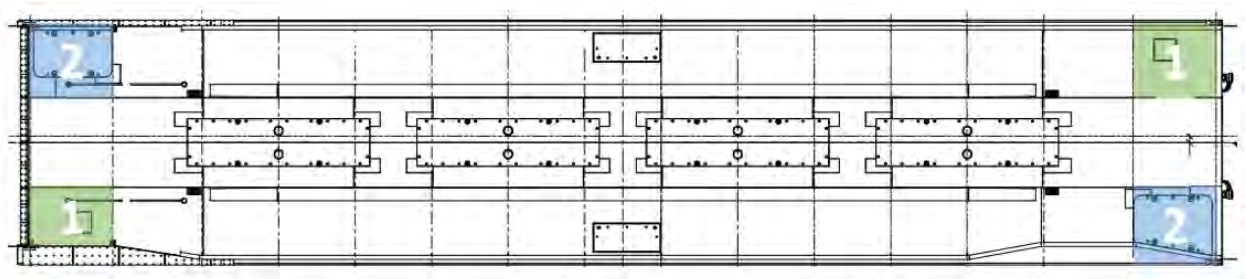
View on sliding gate (1 – staircase / 2 – staircase in corner)
